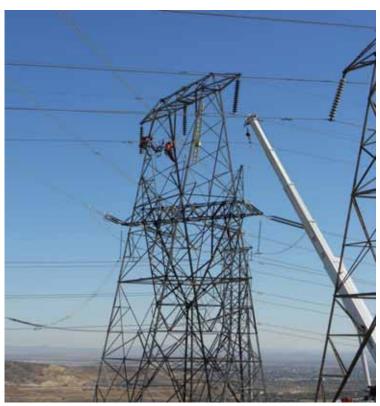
H&M wire crew unclipping wire and installing travelers on existing 220 kV tower on Segment 5.
